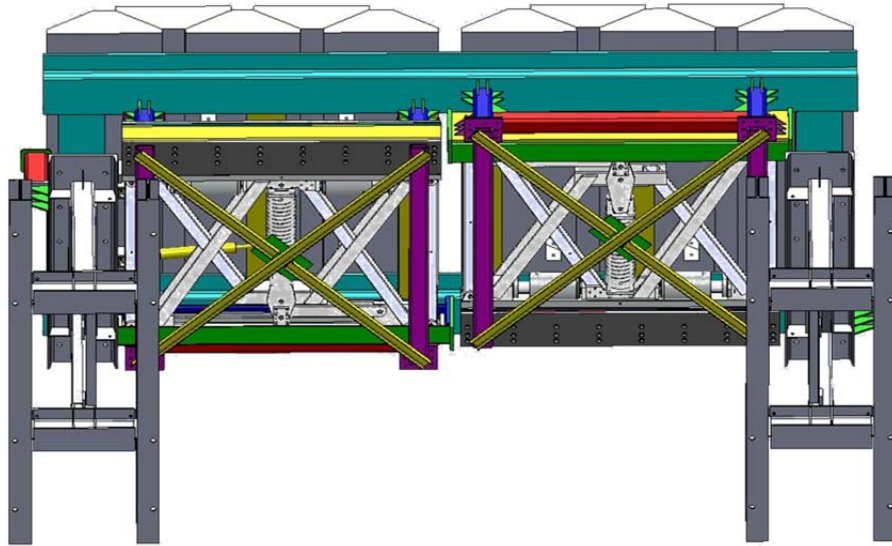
View of underside of bridge model (looking up) showing two NSDs installed below the deck
